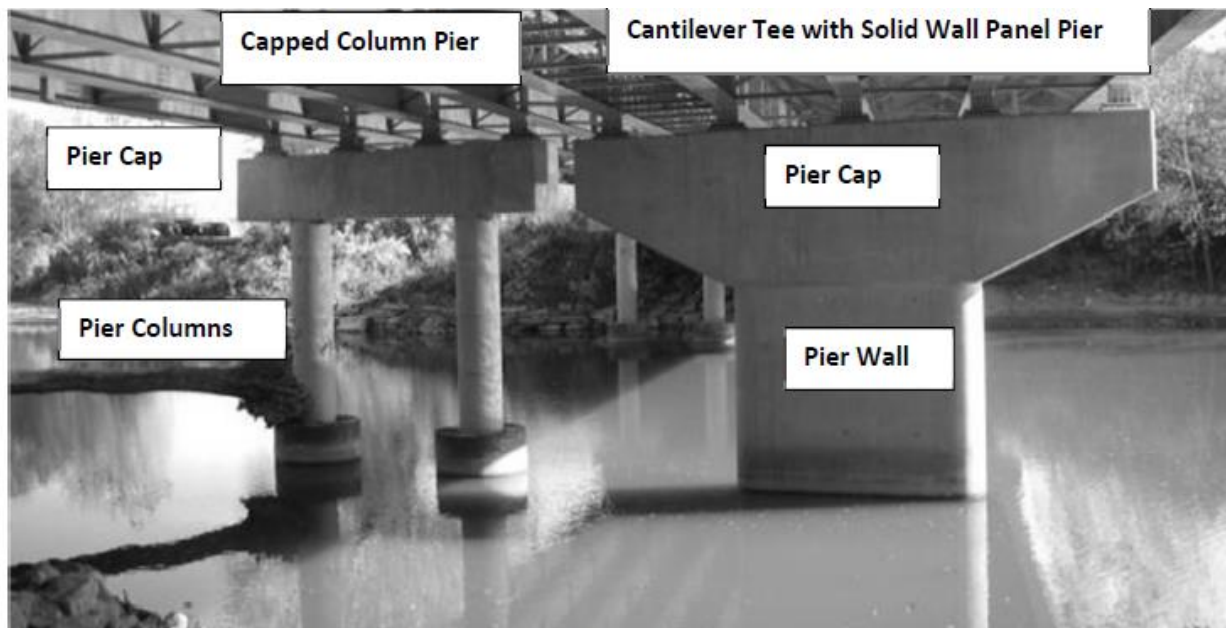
Concrete Capped Column and Hammerhead Cantilever Pier
